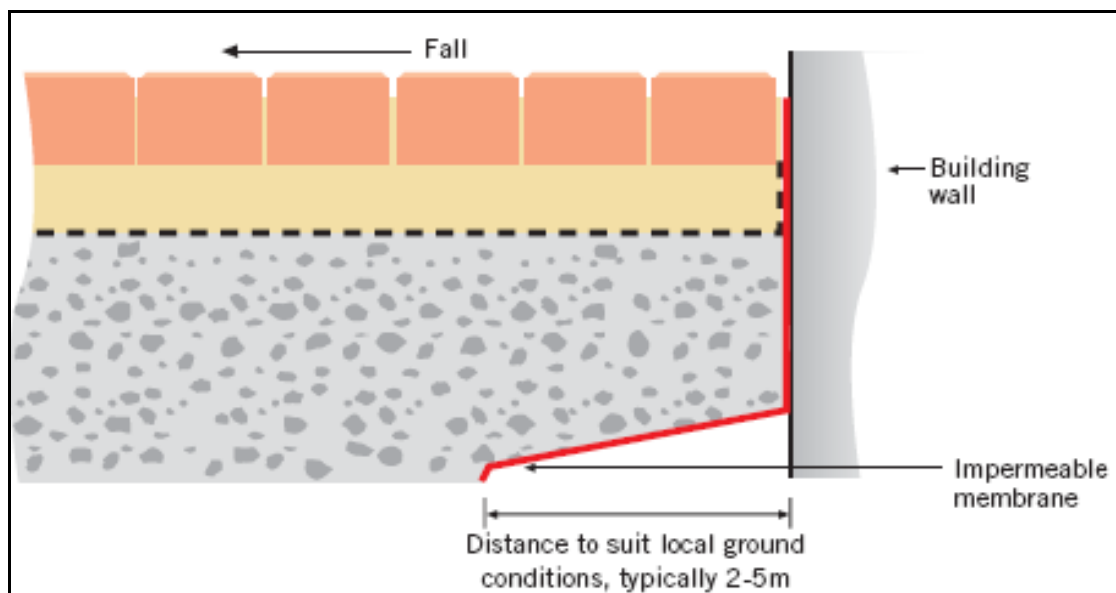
Section through a permeable surface close to building (Source: Interpave *Permeable pavements – guide to the design construction and maintenance of concrete block permeable pavements* dated 2013)
